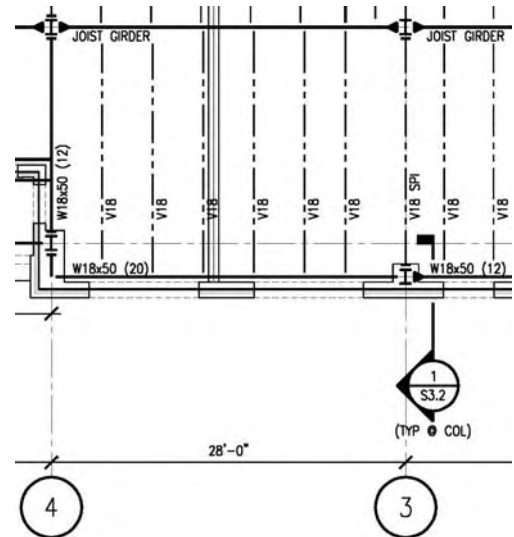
Typical Exterior bay with rigid connections denoted by || and moment connections denoted by ►.
